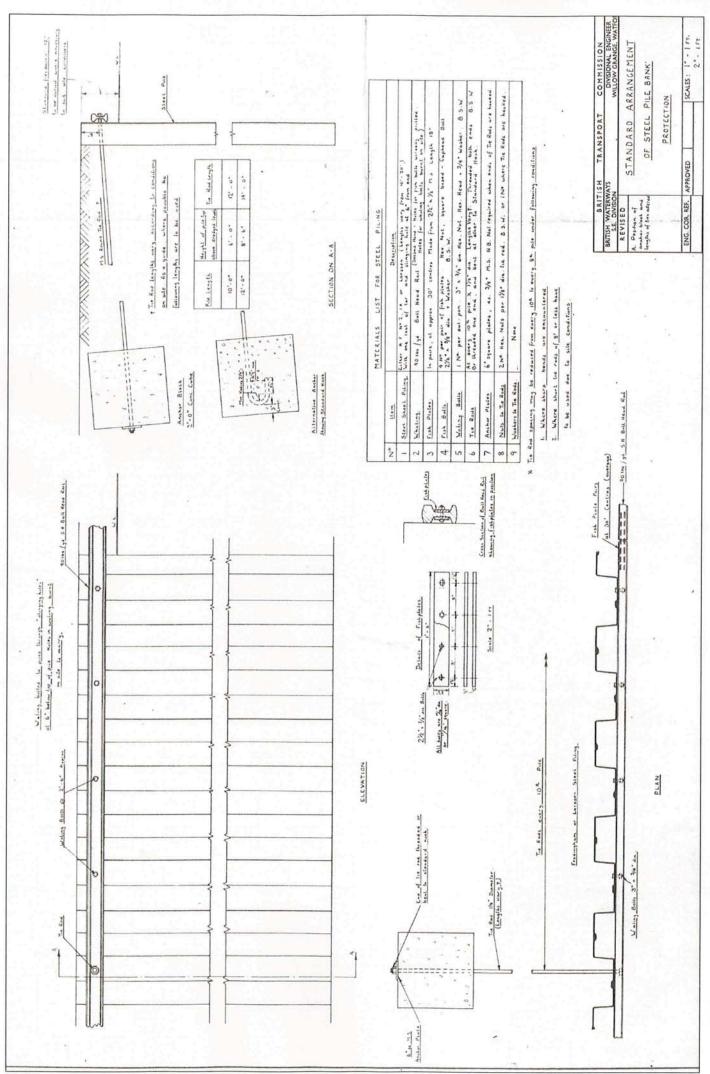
Standard arrangement of steel pile bank along the Bow Back Rivers not to scale
